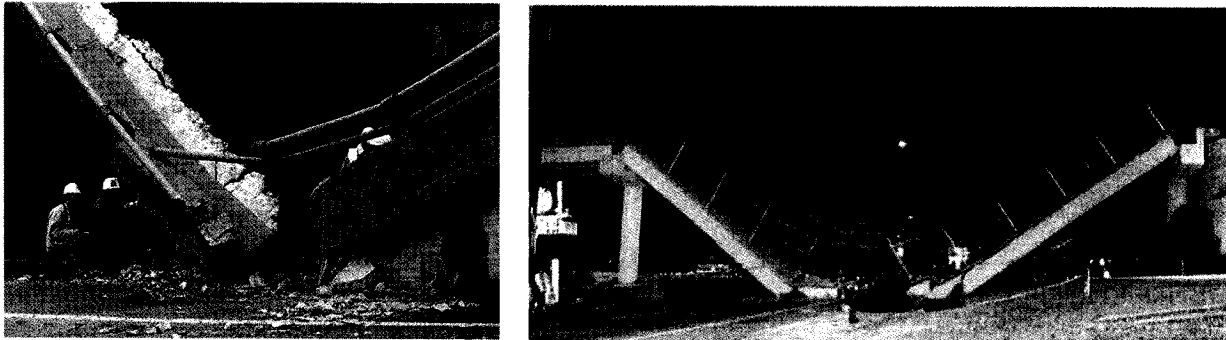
Structural collapse of a reinforced concrete (a) bridge onto highway I-70 in Pittsburgh, Pa (extracted from [17]) and (b) pedestrian walkway onto highway U.S. 29 in Charlotte, N.C. (extracted from [18]).
